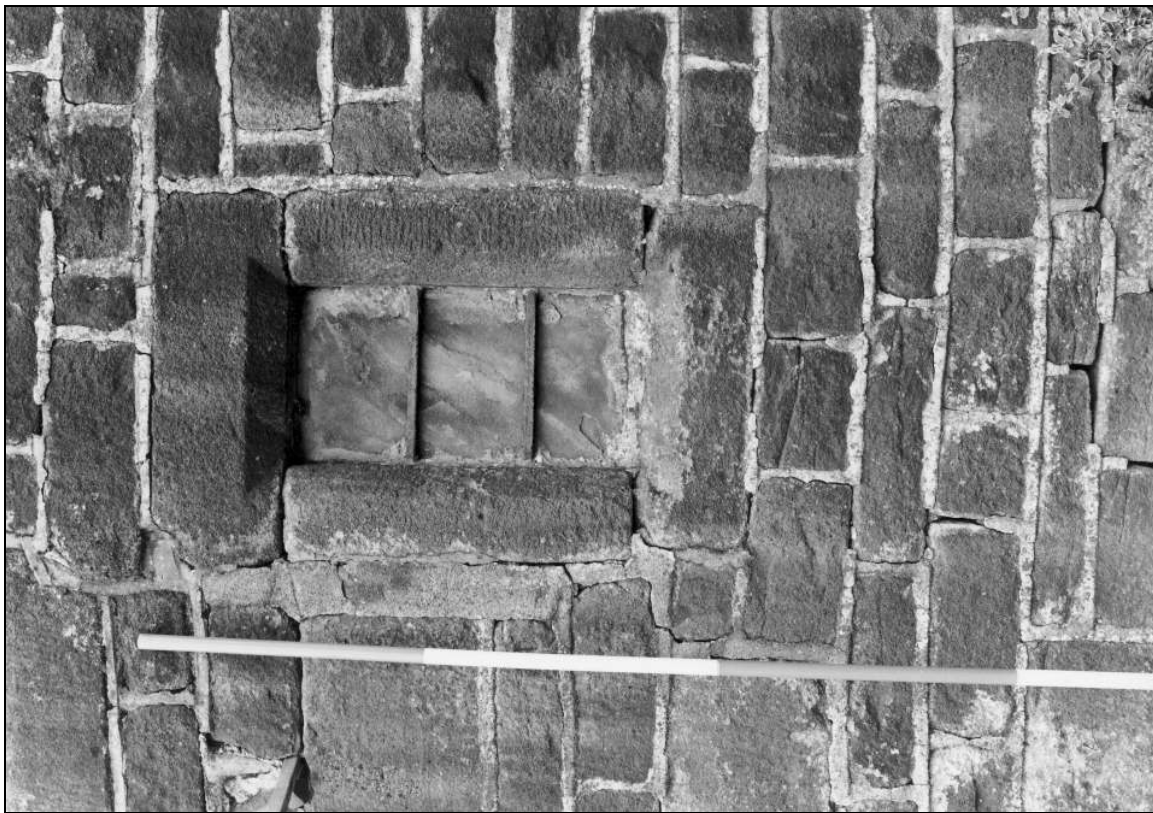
Detail of opening in south-west gable (film 3, frame 1)
